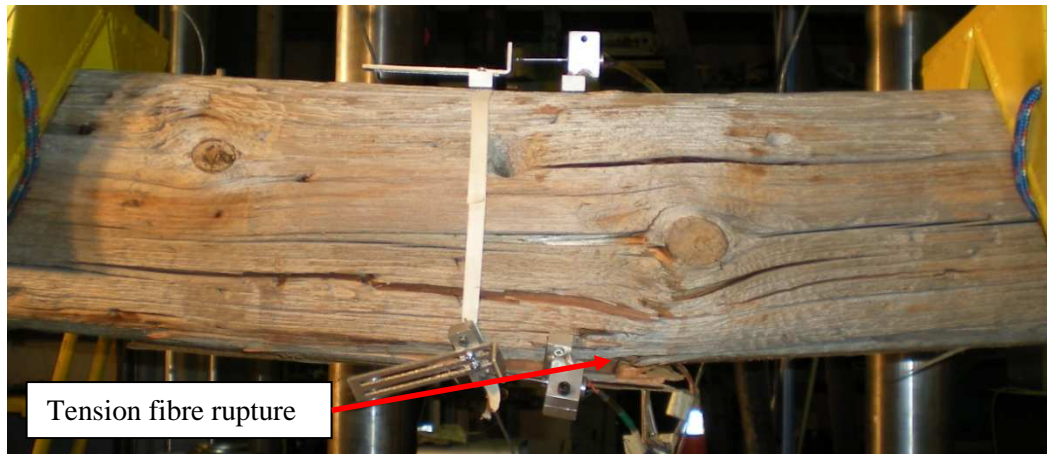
Tension fibre rupture of in-service specimen with tension damage (D-3-1).
